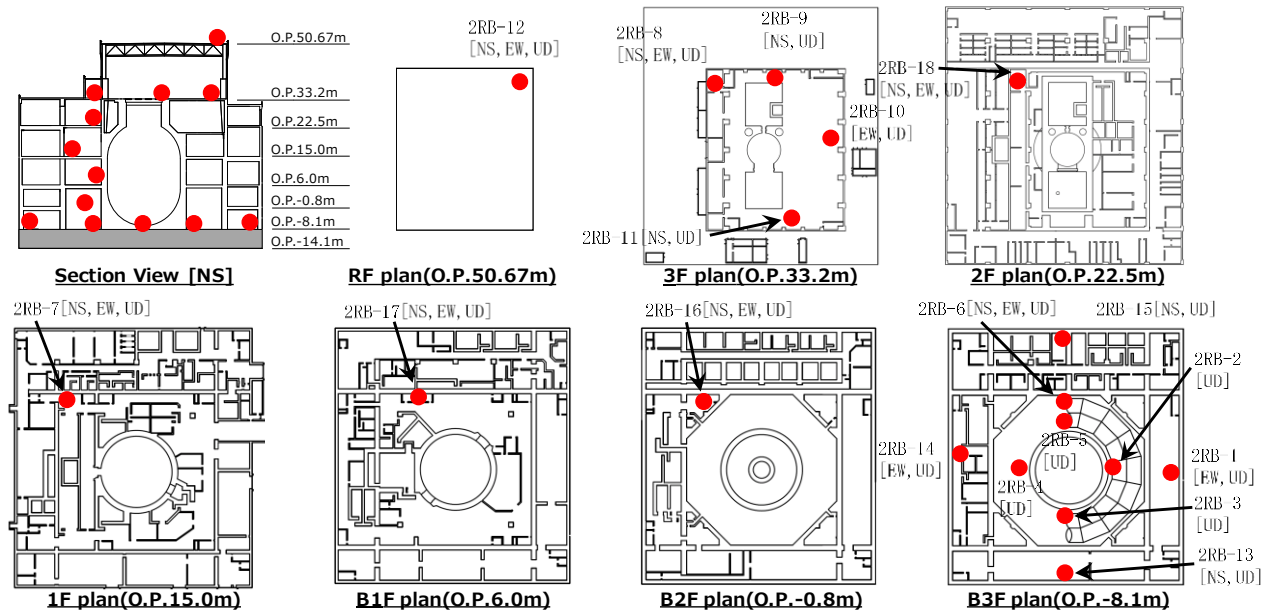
The structural drawing of the reactor building and seismic observation points in the building
